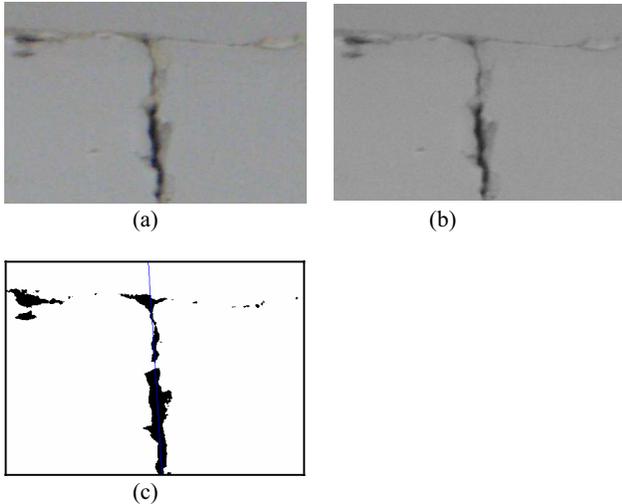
Cracks in a crisscross pattern in the beams; (a) original image (b) grayscale (c) Hough
